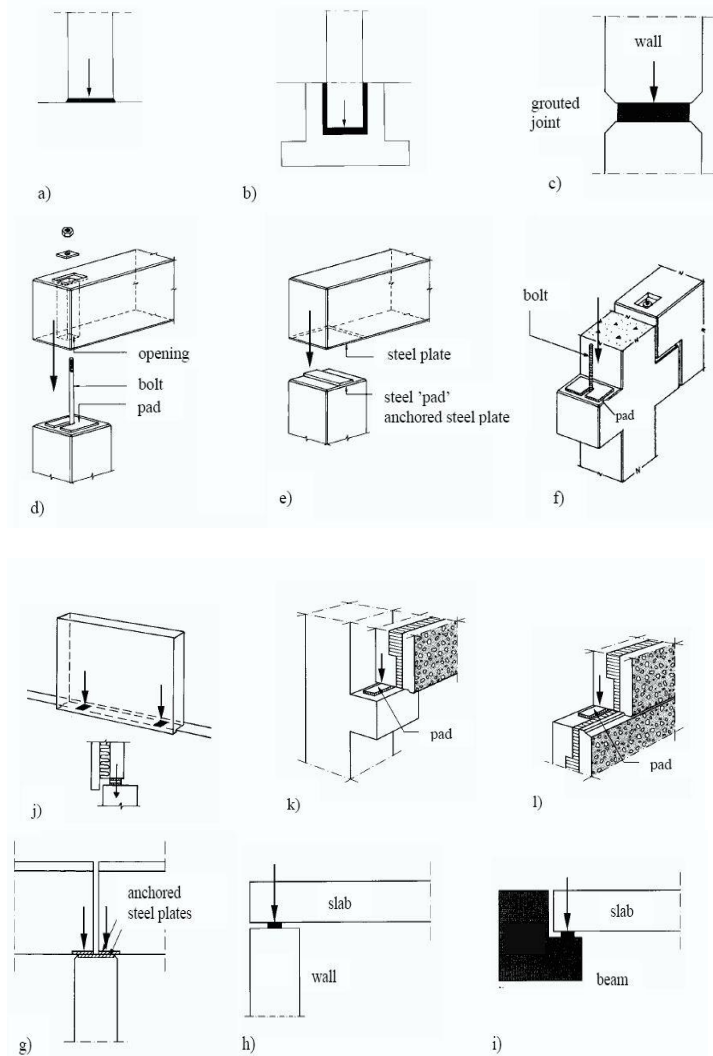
a) column-foundation (grout), b) column foundation (grout), c) wall (column)-wall (column) (grout), d) beam-column (pad), e) beam-column (steel), f) beam-corbel (pad), g) double tee-wall (steel), h) slab-wall (strip), i) slab-beam (strip), j) wall foundation (steel), k) wall-corbel (plastic), l) wall-wall (plastic)
